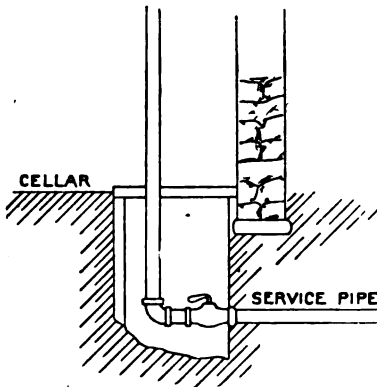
Service Pipe Carried beneath Foundation Wall.
